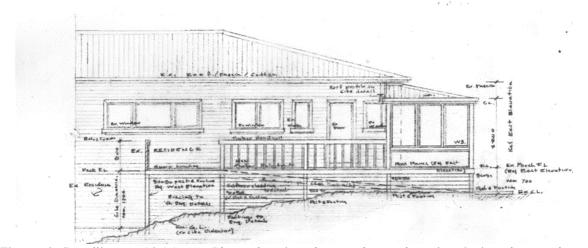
Dwelling at 10 Munro Place showing the southern elevation facing the northern boundary of 12 Munro Place.
